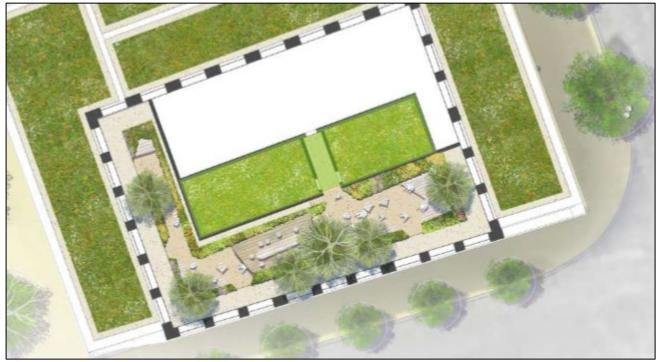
Proposed Rooftop Outdoor Space for PBSA (Block AB)
